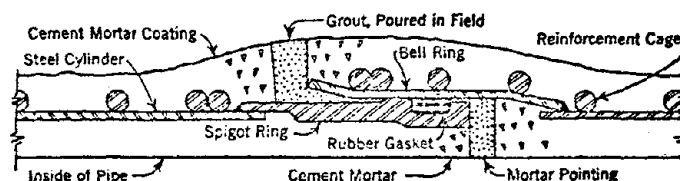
Pretensioned Concrete Cylinder Pipe and Joint RCCP
